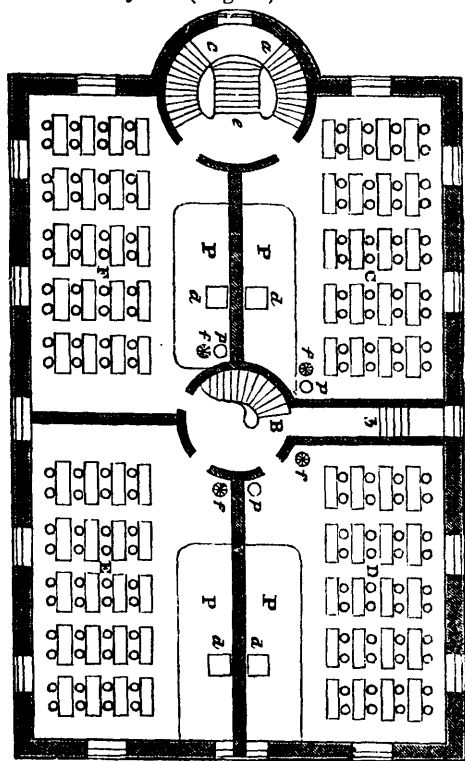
FIG. II.—PLAN OF THE BASEMENT FLOOR.
